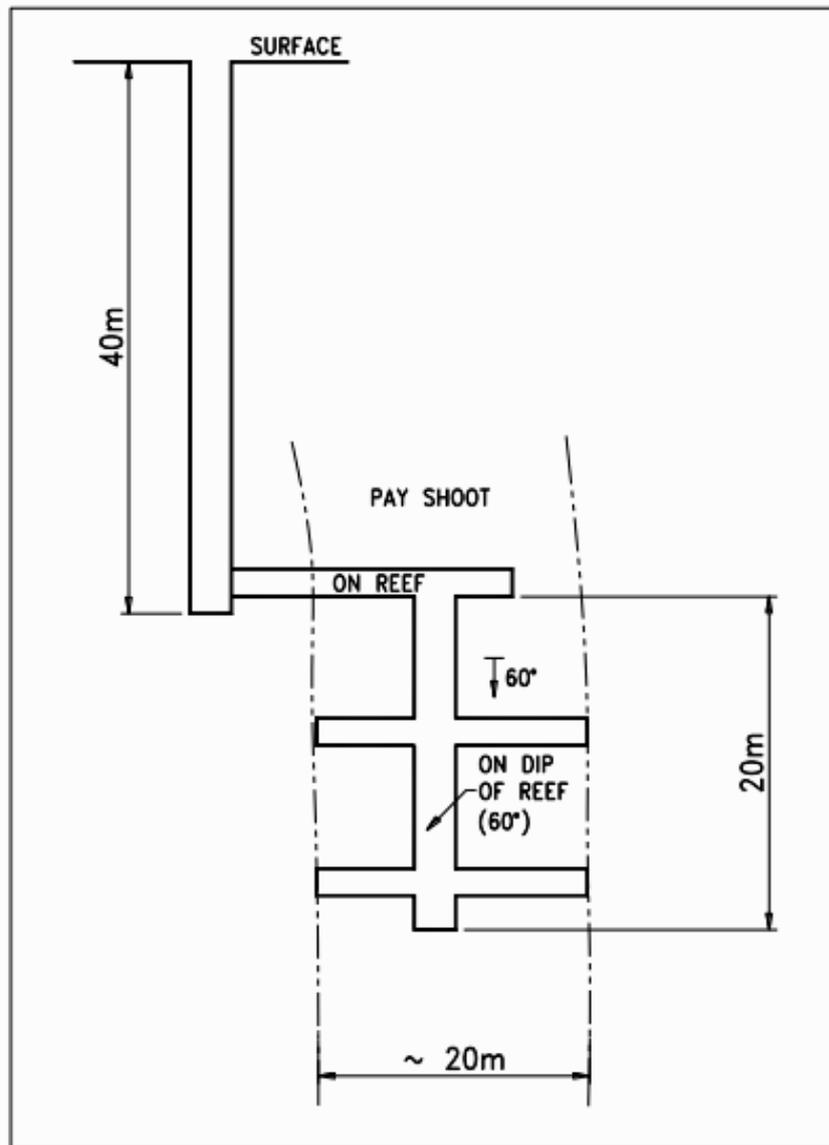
Jumbo Mine Underground Sketch Plan – Vertical Projection
